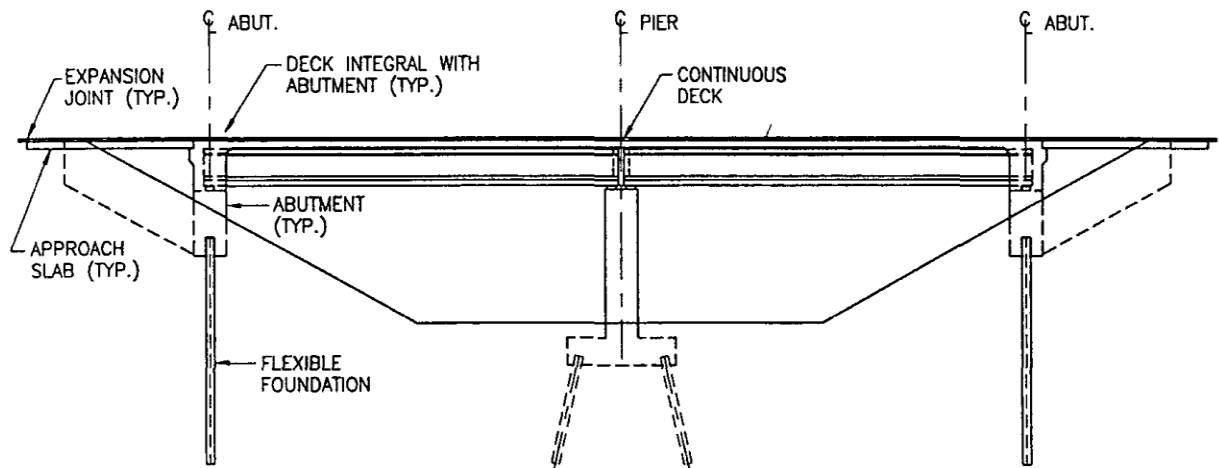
Typical integral abutment bridge design details (Husain and Bagnariol 1996).
